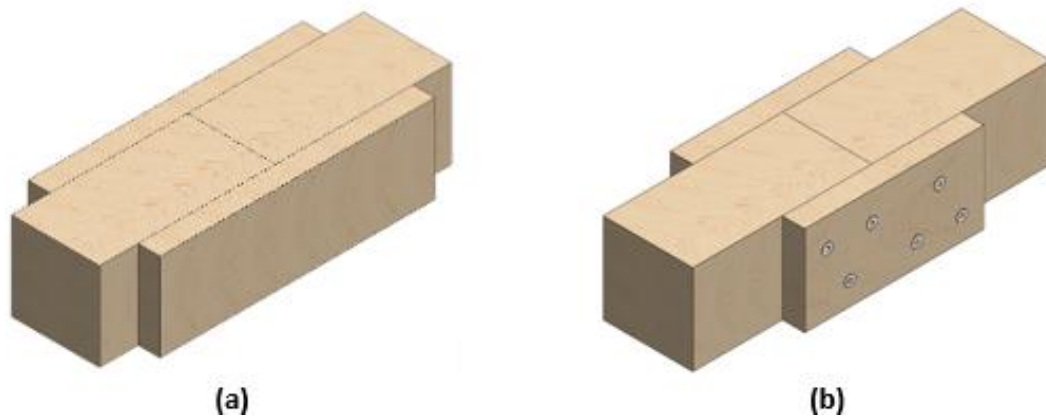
(a) Double strap joint and (b) fastened double strap joint.
